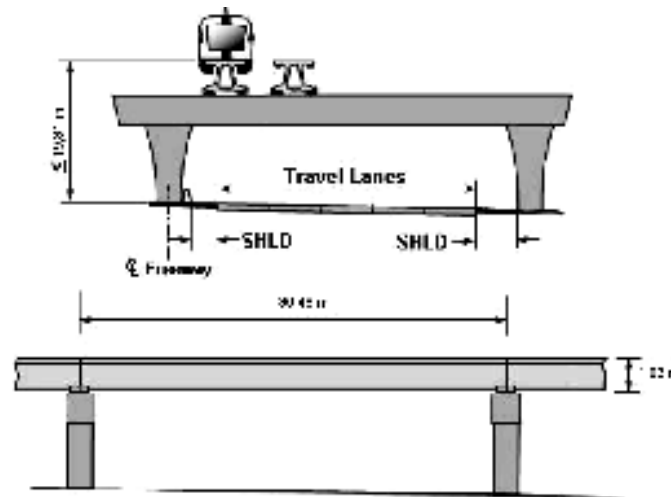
Elevated-guideway configuration: Type B - straddle bents [7]
